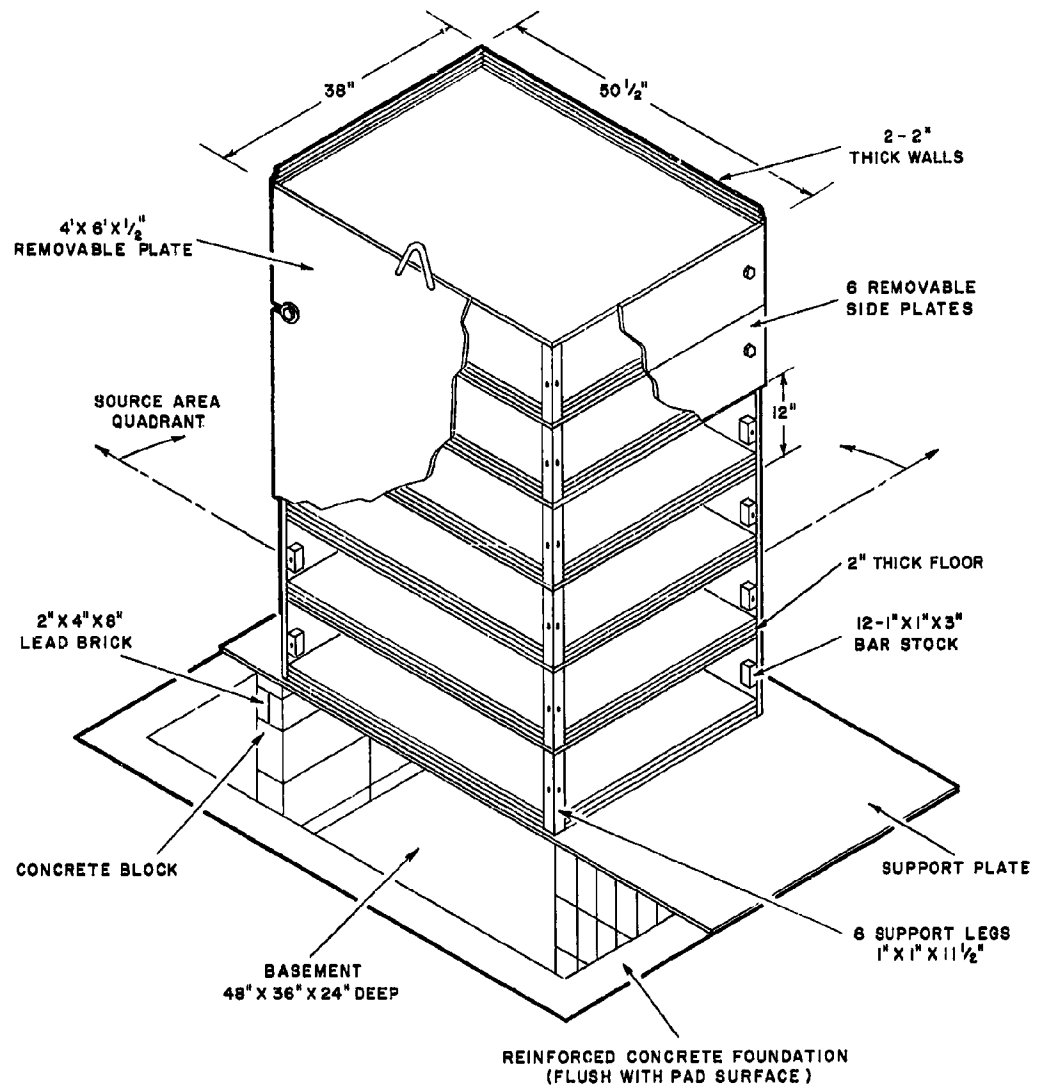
Typical Model Six-Story Structure Arrangement (80 psf Walls and Floors)
